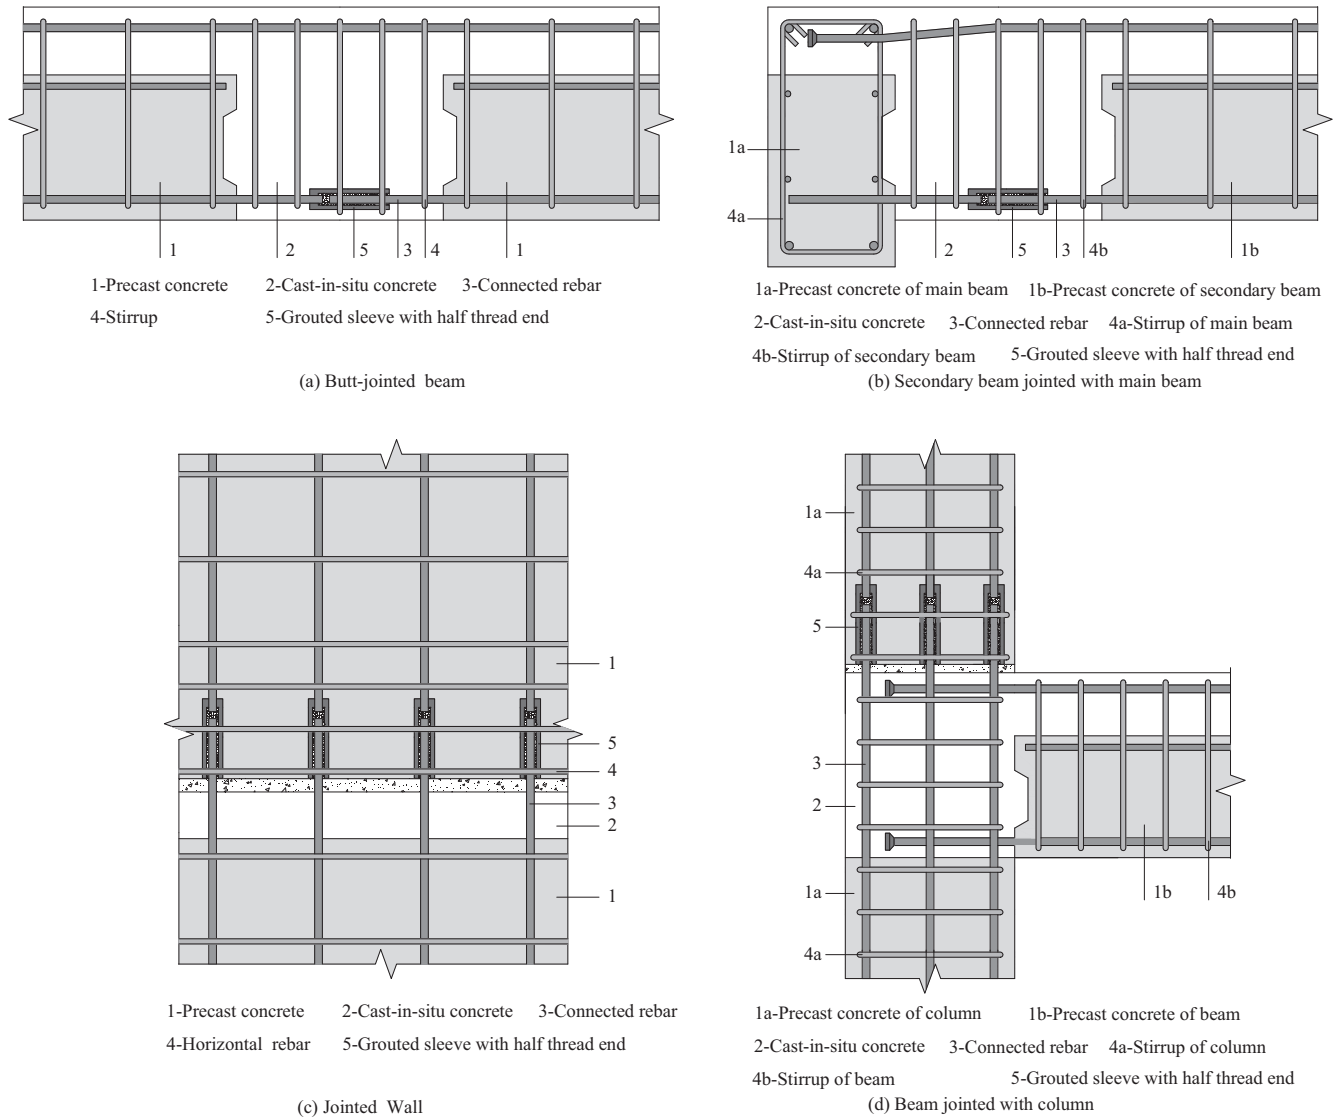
Half grouted sleeve connections used in precast concrete structure.
